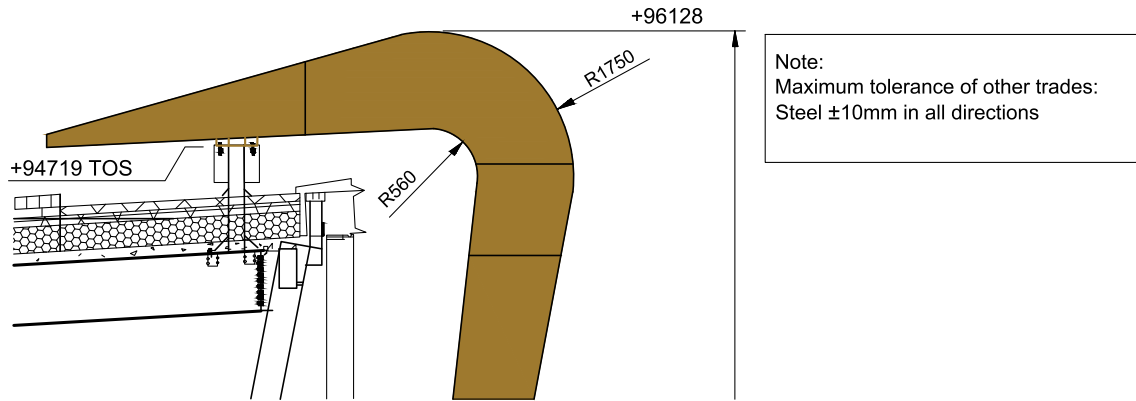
Tolerances displayed on drawings for fins
